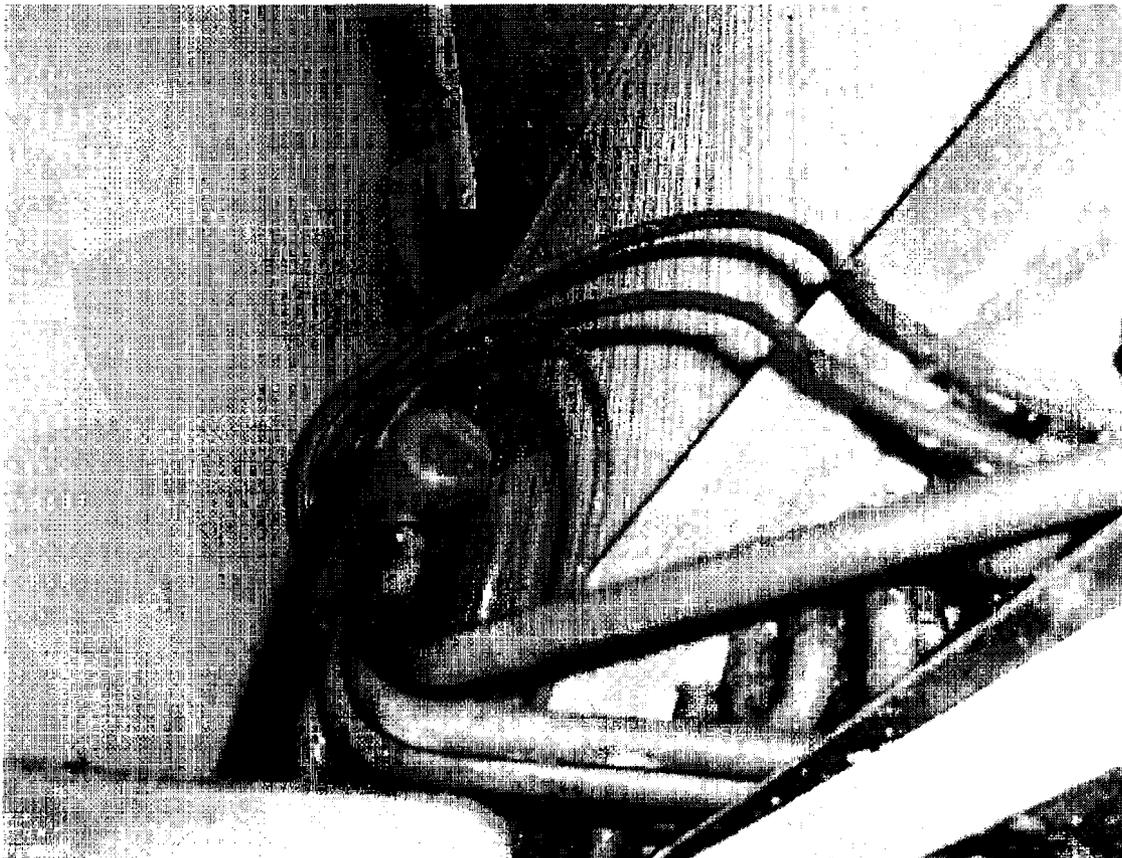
shows a closer view of the evaporator coils beginning to corrode.
